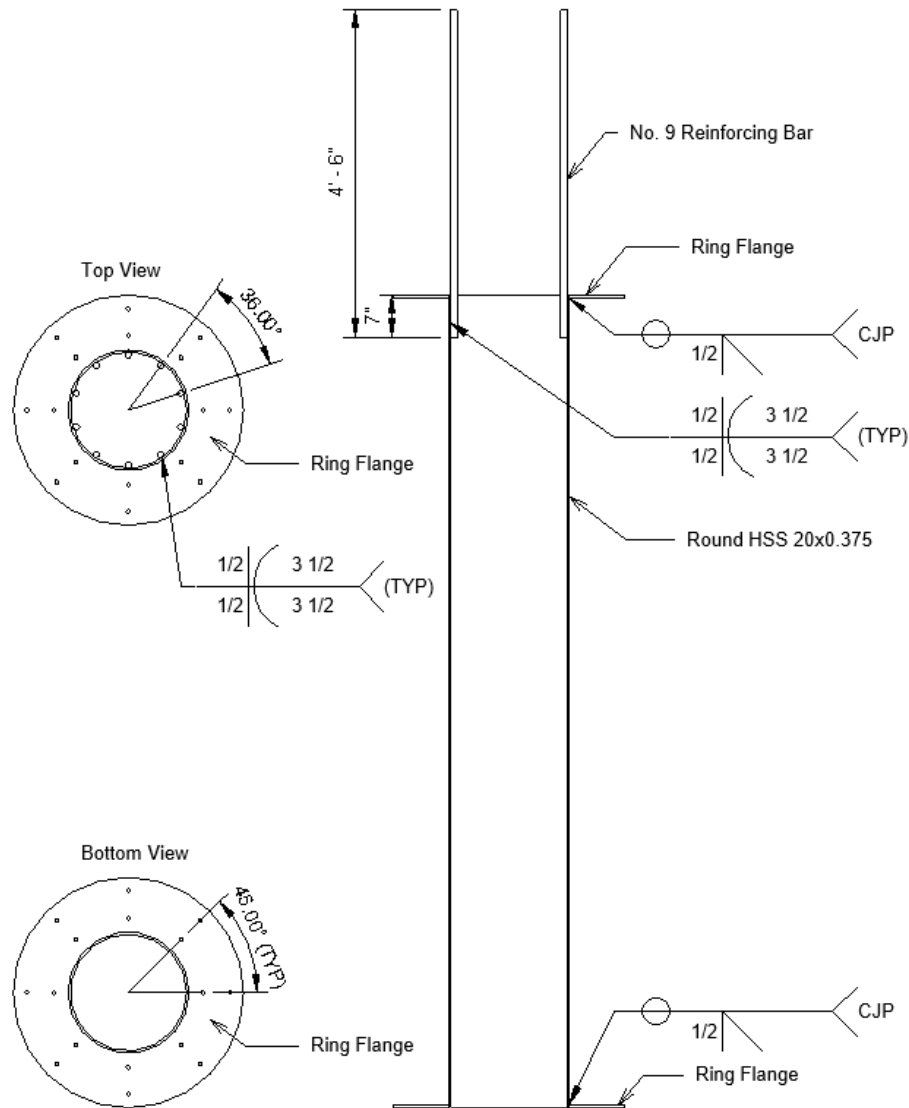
CFST Column with Ring Flange to RC Slab Connection (connection shown only has bolts in the ring)
